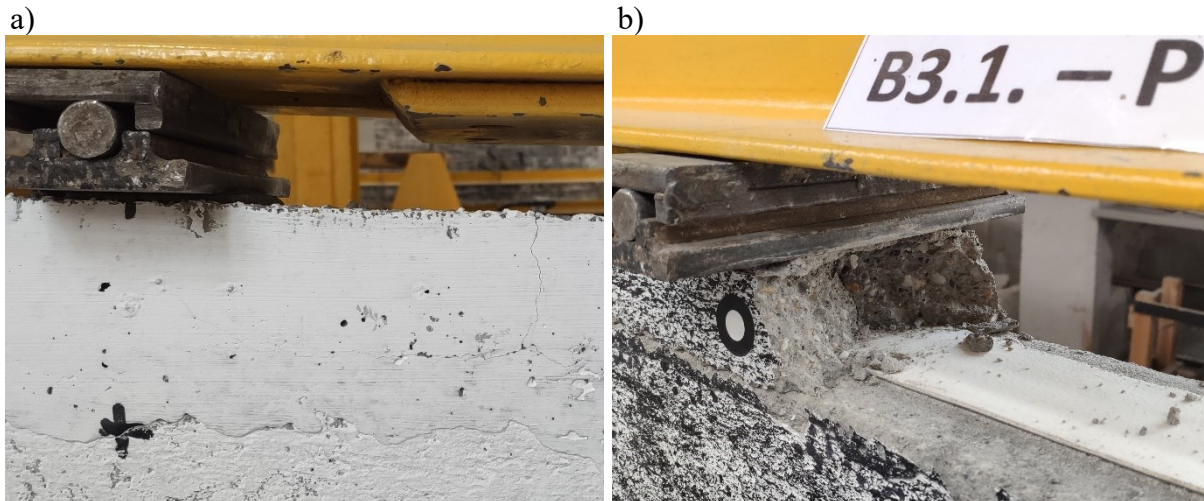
View of topping concrete cracking: a) B1.2-C, b) B3.1-P
